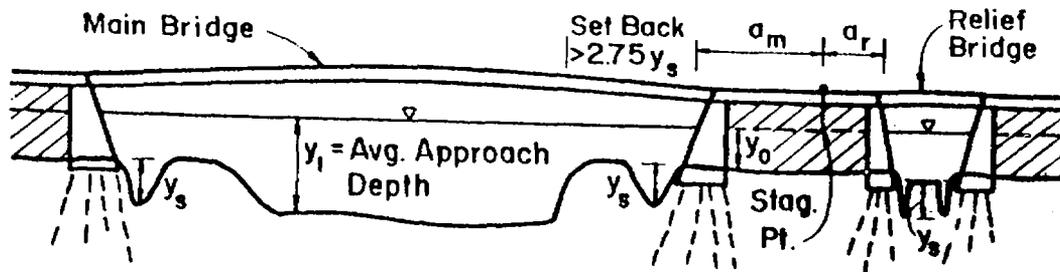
Bridge Abutment Set back from Main Channel Bank and Relief Bridge .
